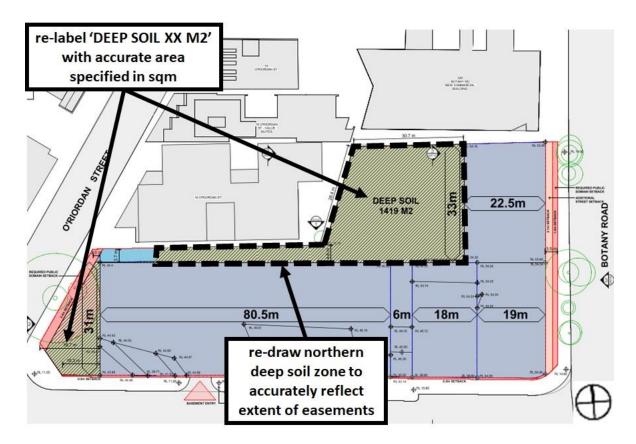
Recommended design modifications to accurately illustrate deep soil zones.
